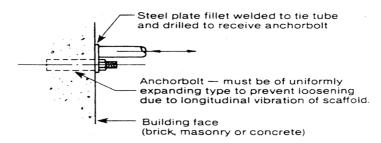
Anchor bolt tie. Vertical or horizontal section through wall where no openings or members are available for tying to.
